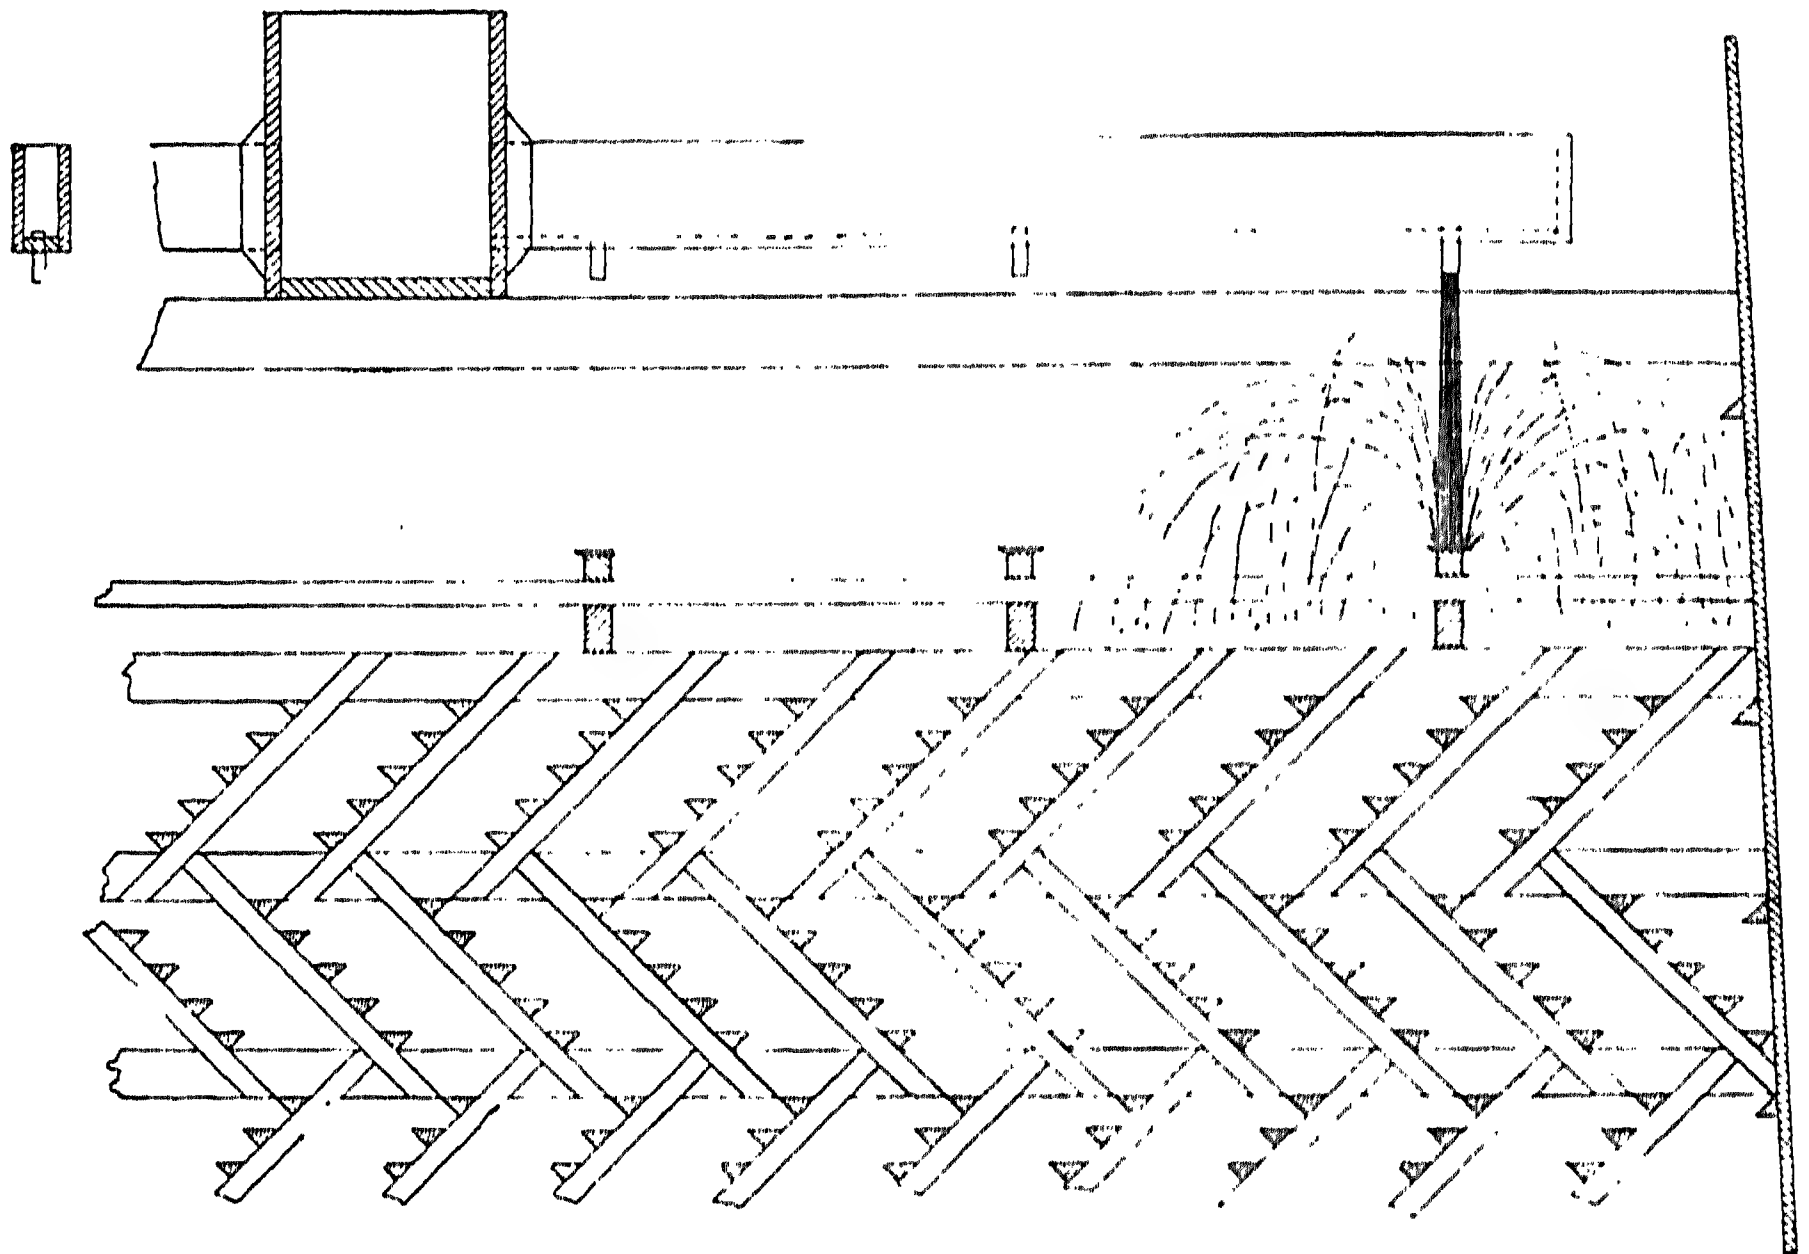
Arrangement of Splash-bars, &c.—Premier Cooler and Engineering Company
